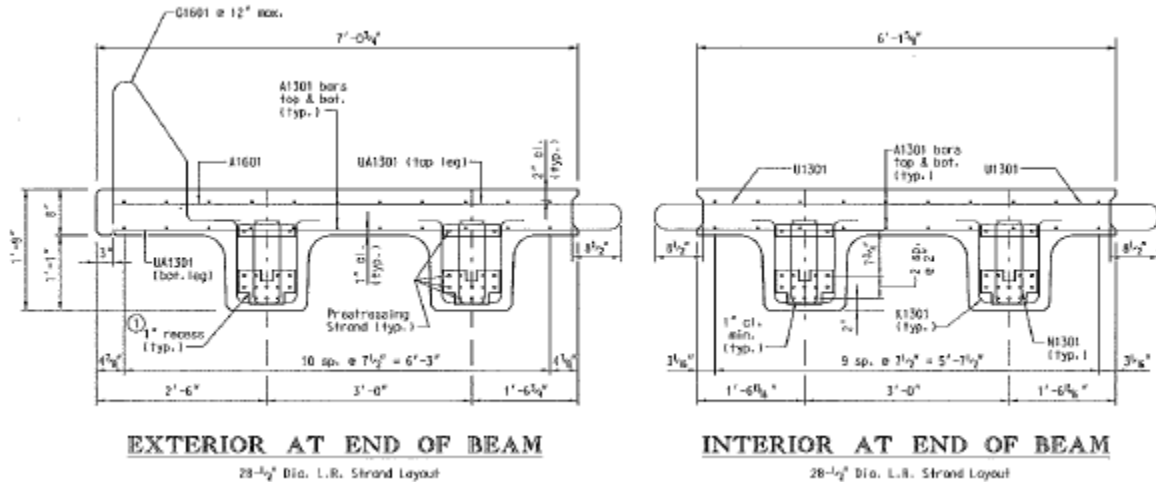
Hanging Rock Creek Bridge NEXT-D bridge section.
